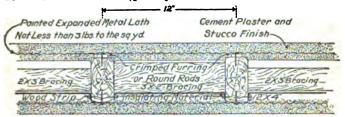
Wall Section Showing Detail of Stucco Construction as Recommended by the Associated Metal Lath Manufacturers.
